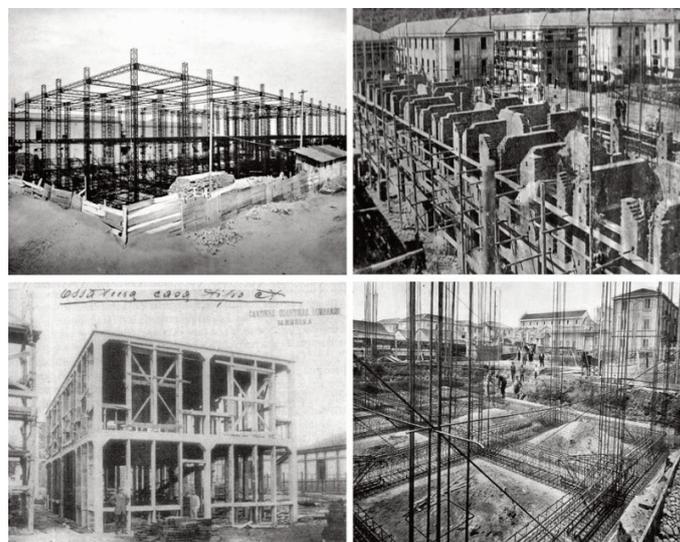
Construction systems for “anti-seismic” structures permitted after 1908 Messina earthquake: frames of steel (1909 et seq.); reinforced masonry (from 1912 to 1924); reinforced concrete frames with diagonal bracings (1909); frames in reinforced concrete with rigid knots (1909 and then since 1924).
